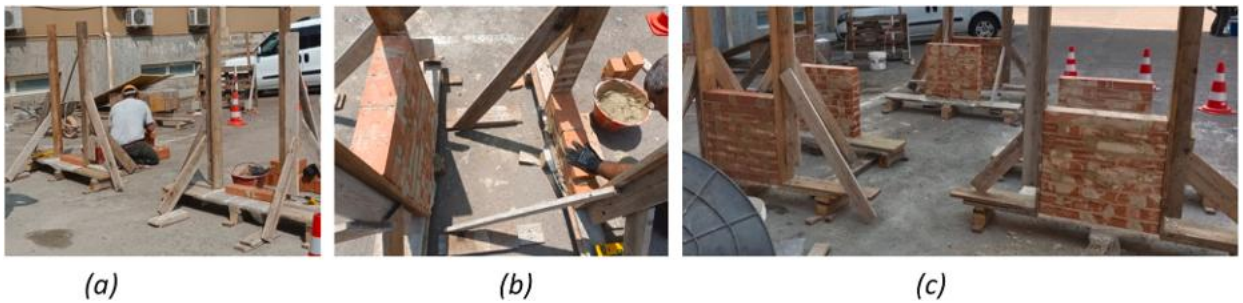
(a) masonry assembly formwork, (b) Construction, and (c) un-strengthened masonry walls.
